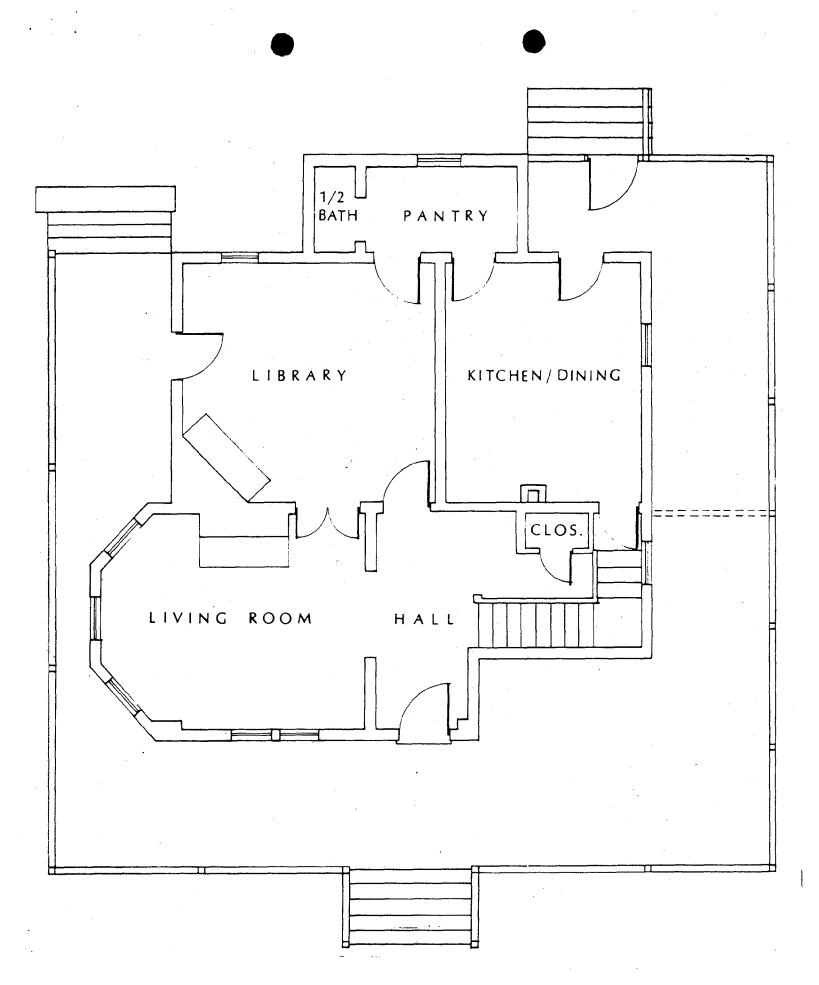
Plan of first floor and exterior wrap-around porch and stairs
